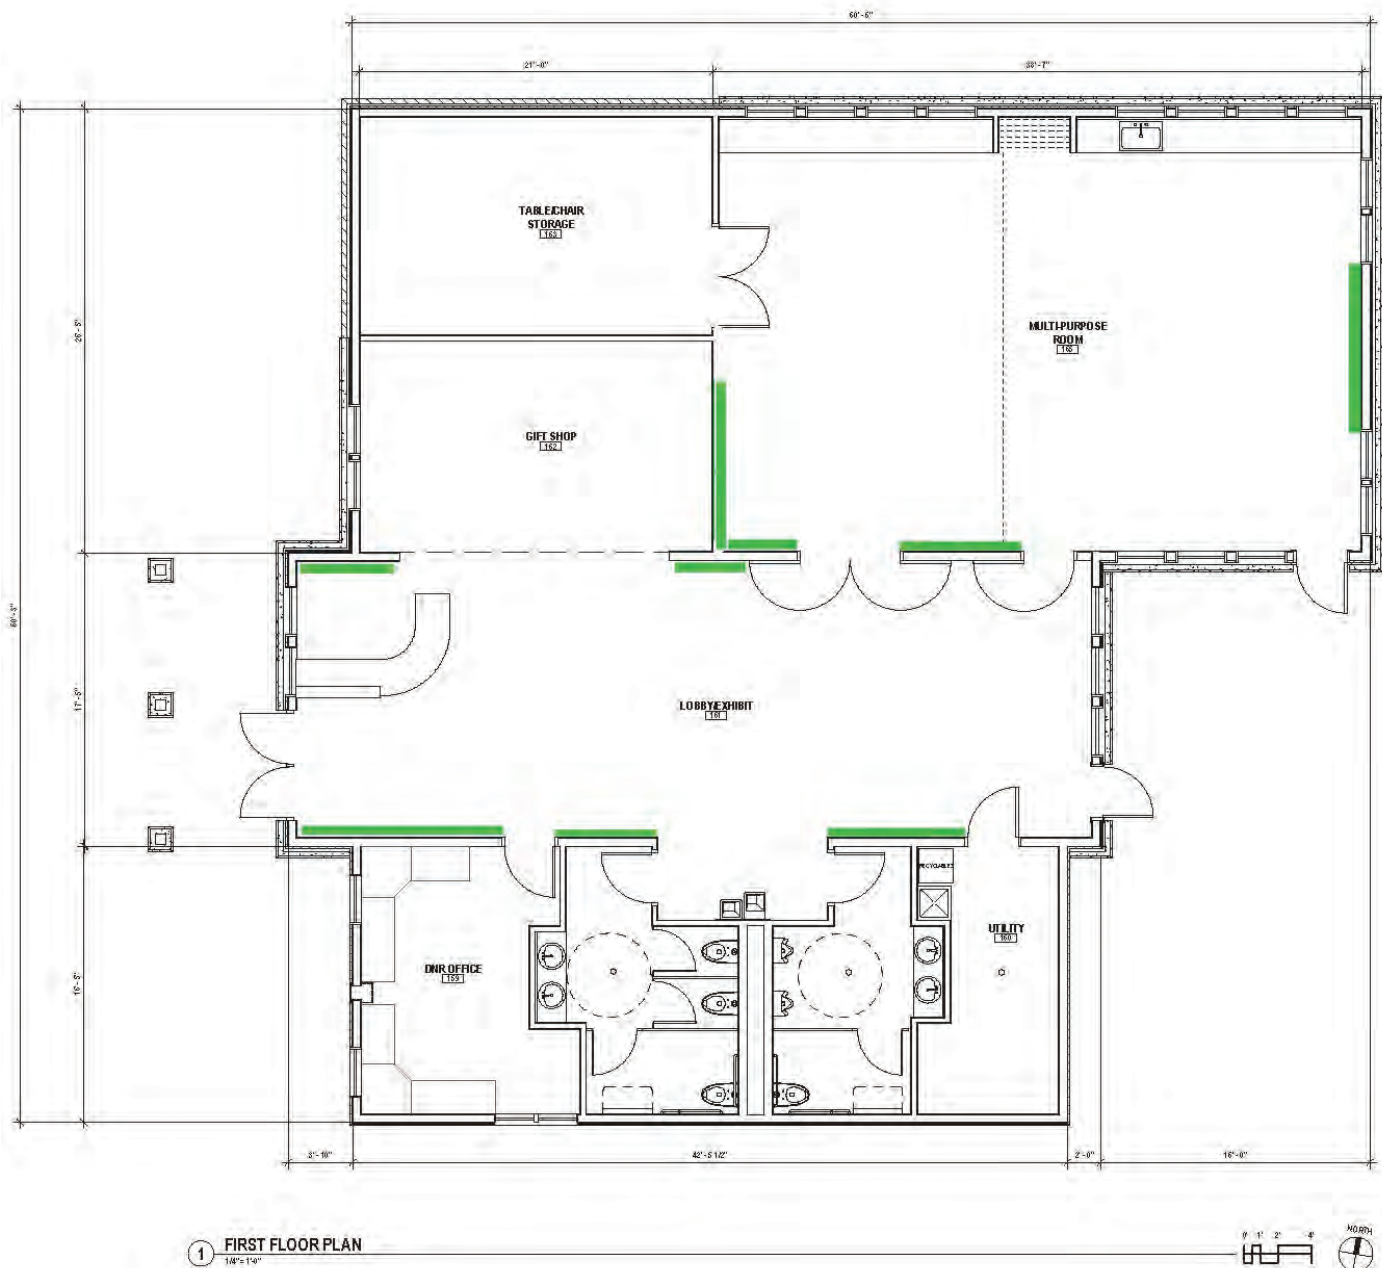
Floor plan illustrating the available wall space for displays, denoted in green.
